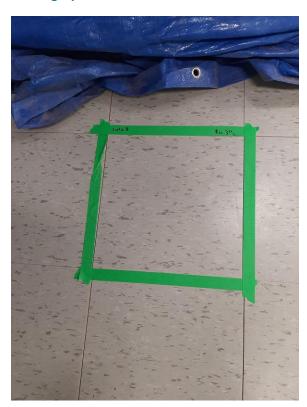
LW05 – 4<sup>th</sup> Floor Corridor - Wall
